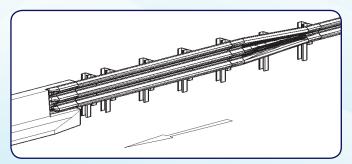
Connecting concrete safety barrier to w-beam guardrail using 6.0m thrie beam transition section at 0.5m and 1m post spacing
